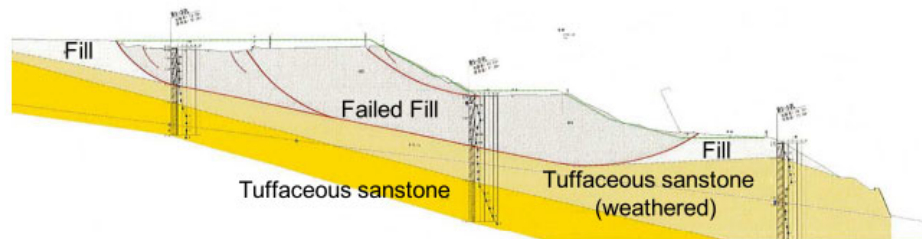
Cross-sectional profile of failed slope in Block 1-1
